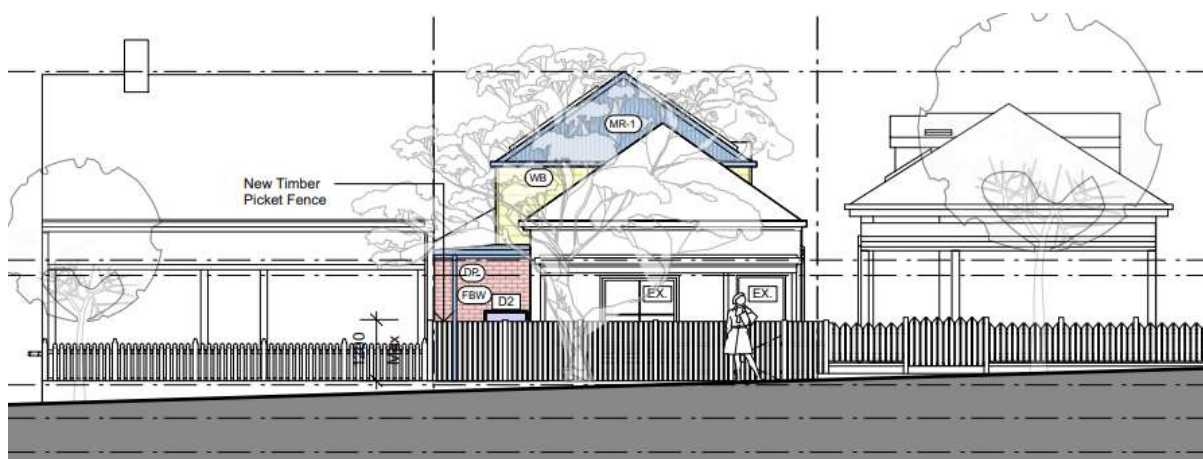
South Elevation of subject site and adjoining properties, DA07 Issue B
